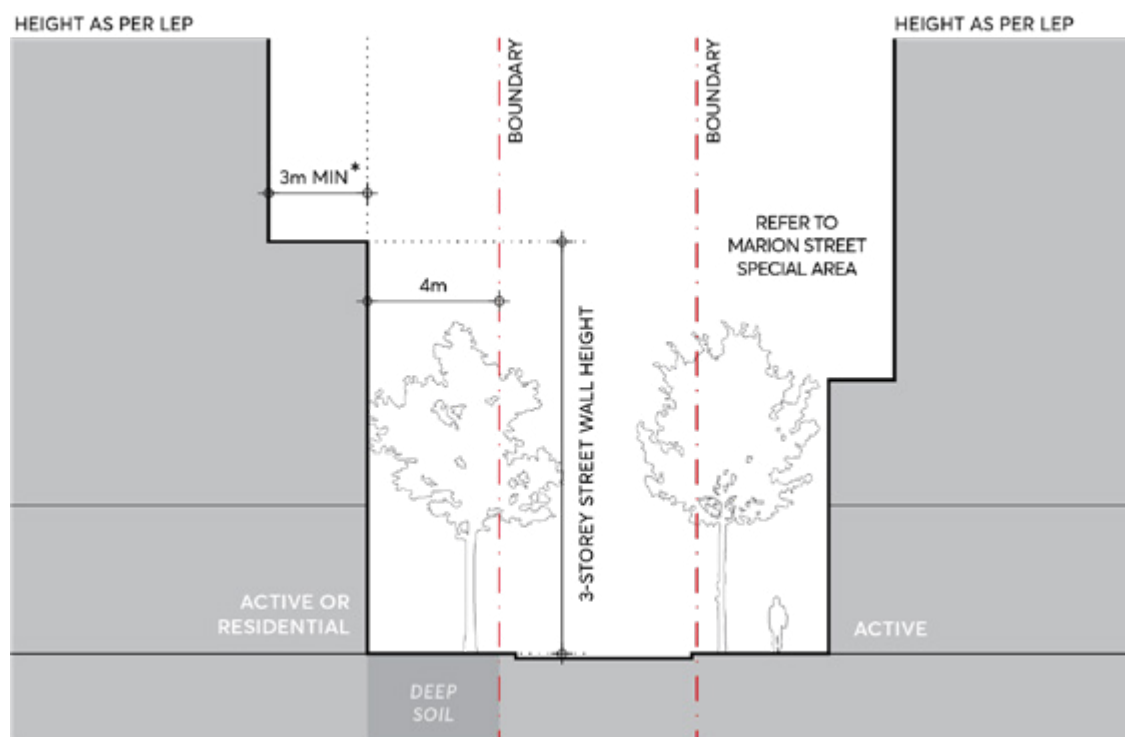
Raymond Lane (Section C) Setbacks and Street Wall Height
